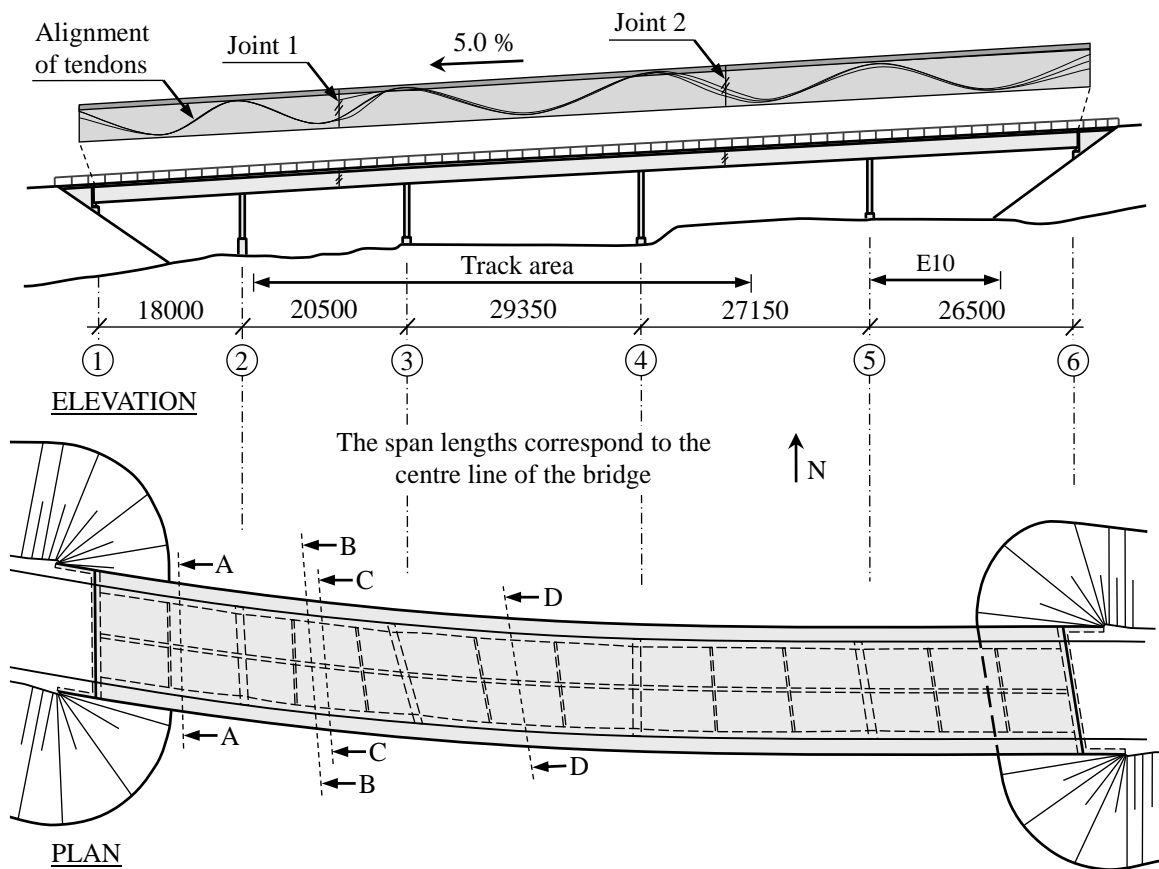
Elevation and plan view of the Kiruna Bridge, Bagge [2].
